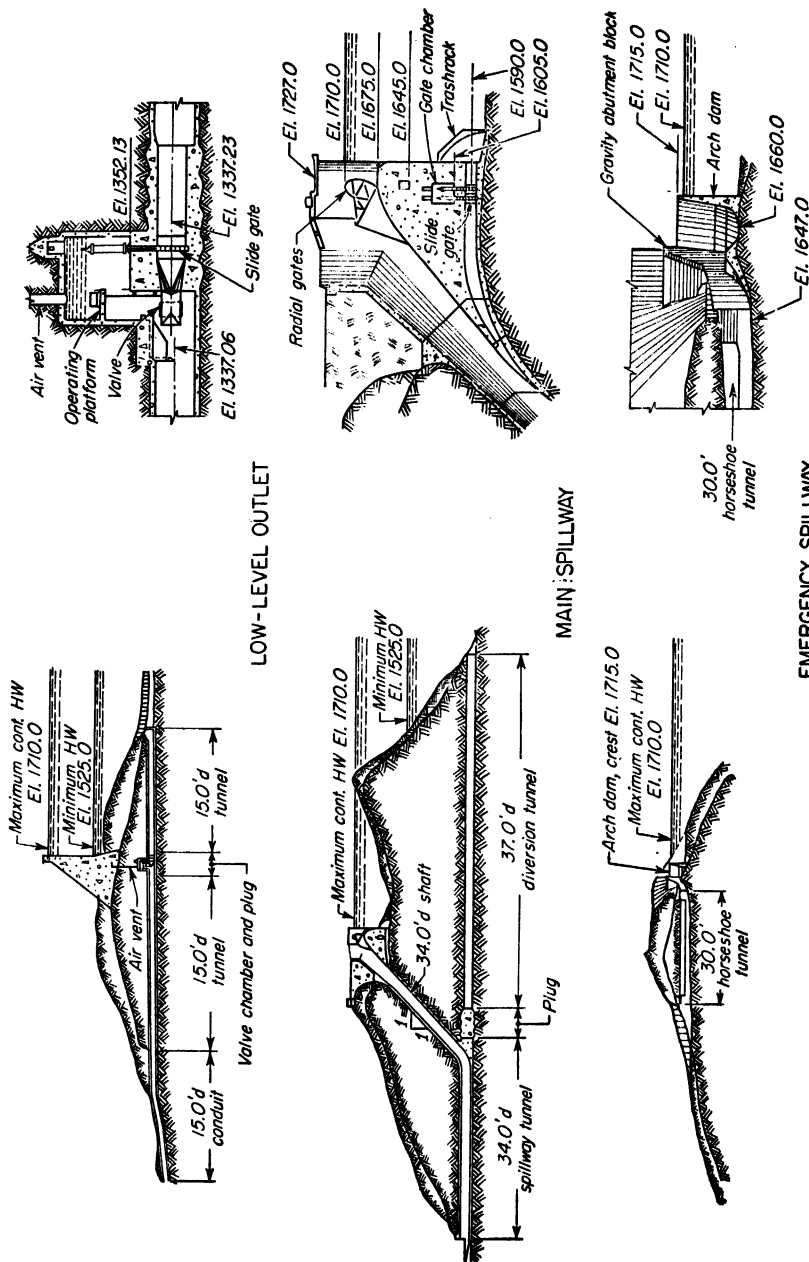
Spillway and outlet works, Fontana Dam, TVA.
